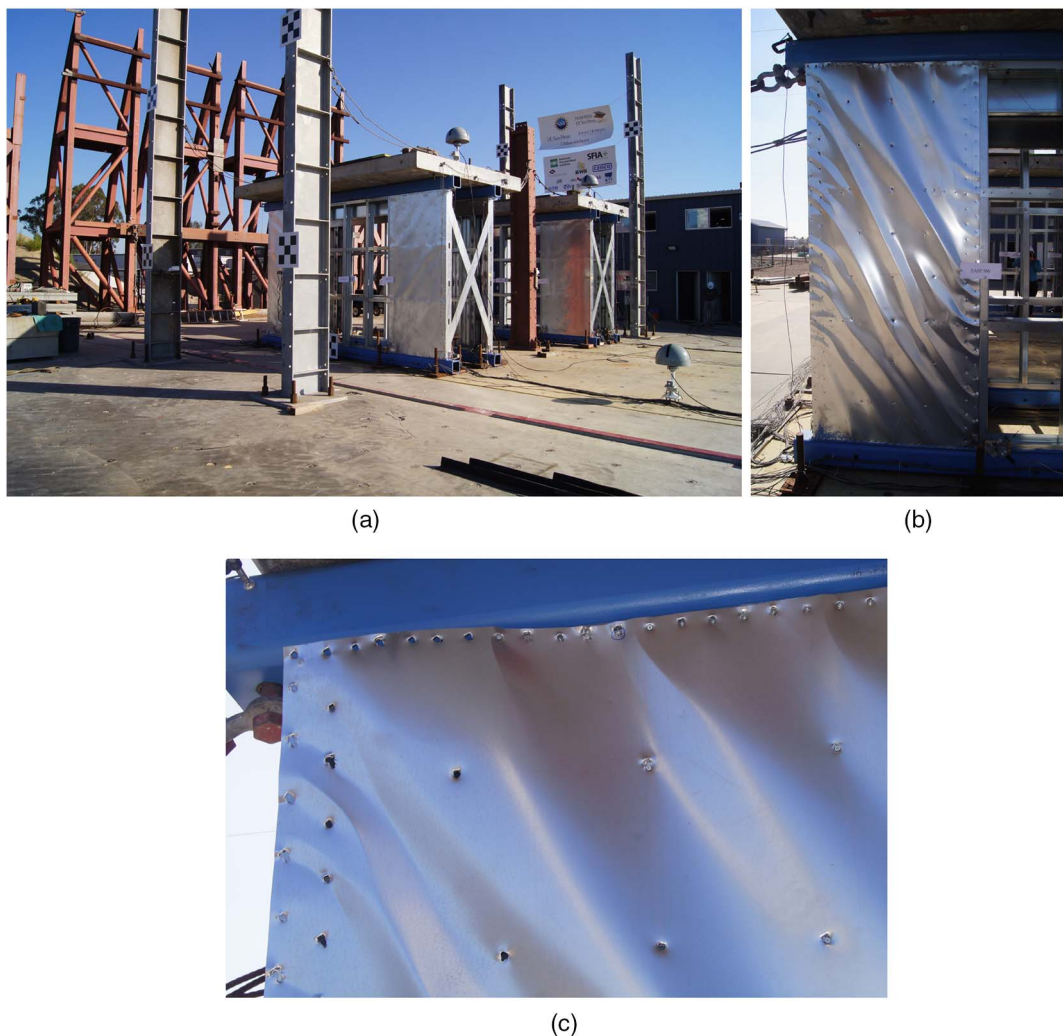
CFS framed steel sheet sheathed shear wall line test of Singh et al. (2021): (a) wall line test; (b) steel sheet buckling; and (c) connection failure. (Reproduced from Singh et al. 2021.)
